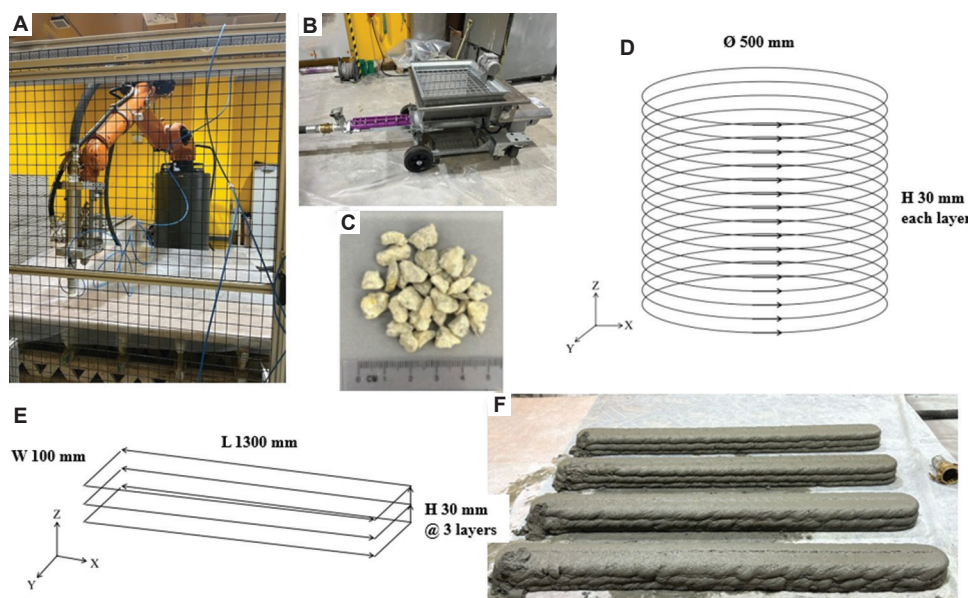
Set up of the 3D-printed large-aggregate concrete. (A) Six-axis robotic arm printer. (B) Pump for material delivery. (C) Large aggregates. (D) Tool path for buildability. (E) Tool path for mechanical testing samples. (F) Printed samples for mechanical properties testing
